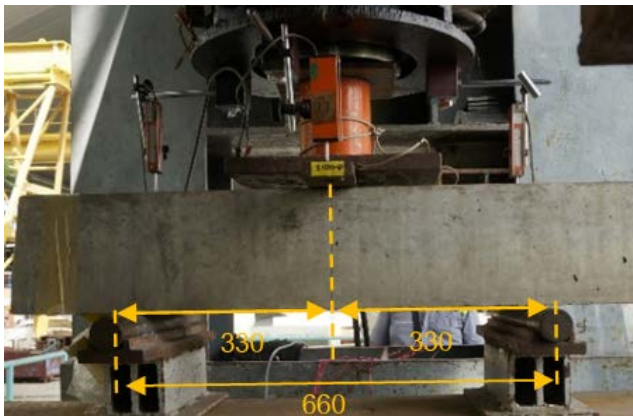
Actual instrumentation and test setup at the expected failure side, unit : mm
